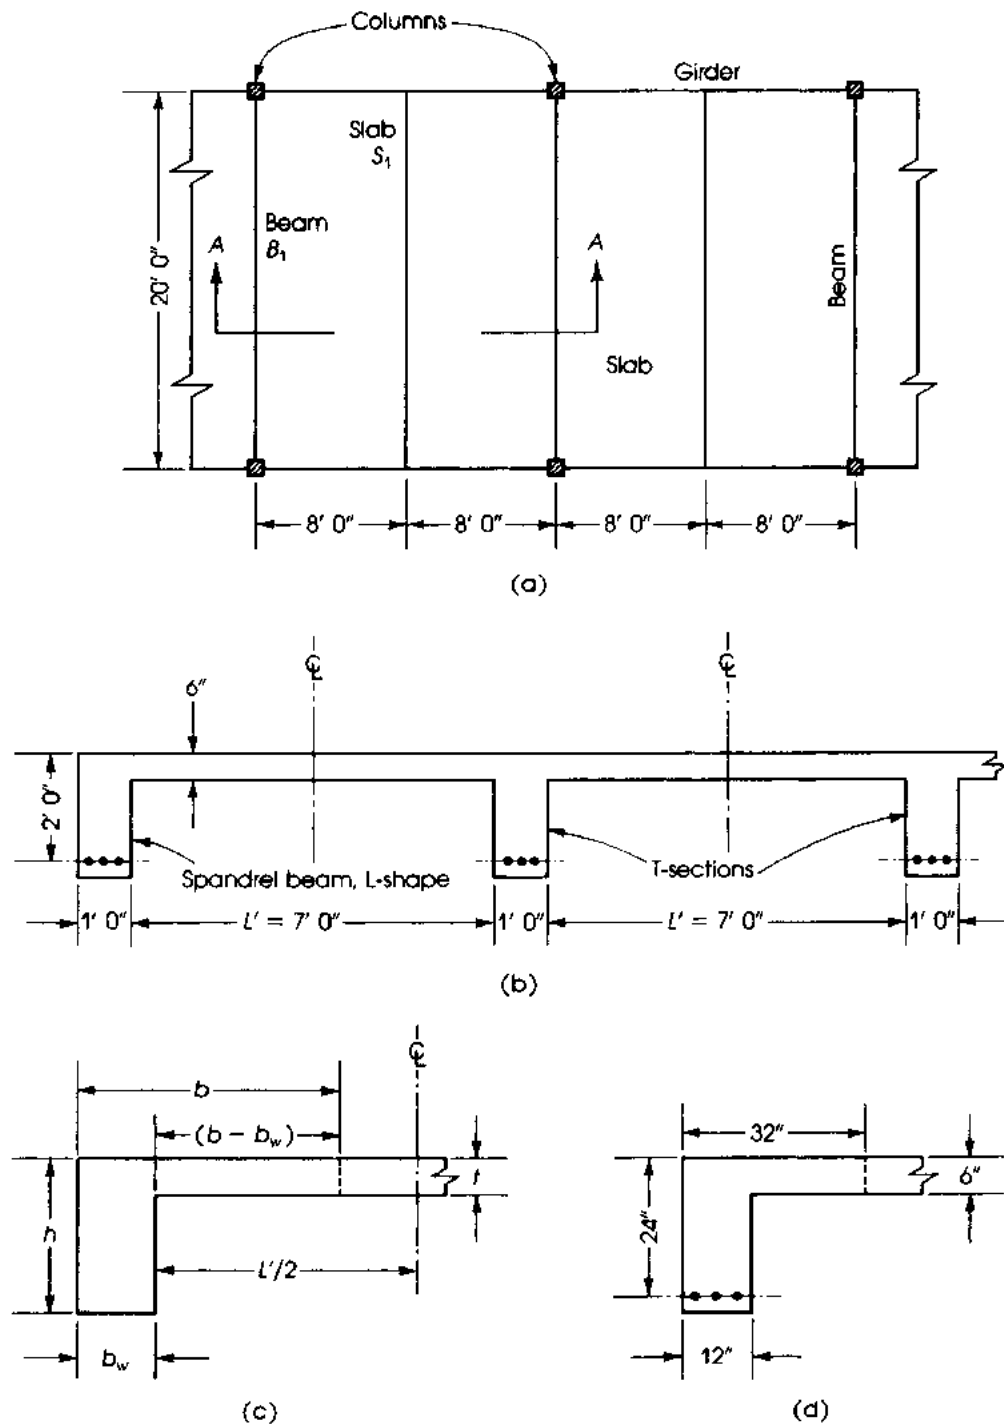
Slab-beam-girder floor, showing (a) plan, (b) section including spandrel beam, (c) dimensions of the spandrel beam, and (d) its effective flange width.
